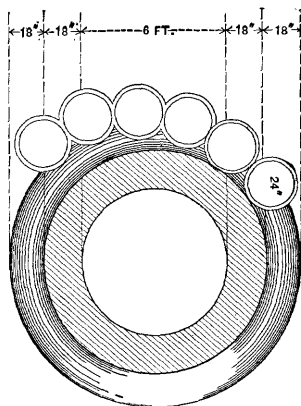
Plan of valves, rock-filled dam, East Park dam site.
